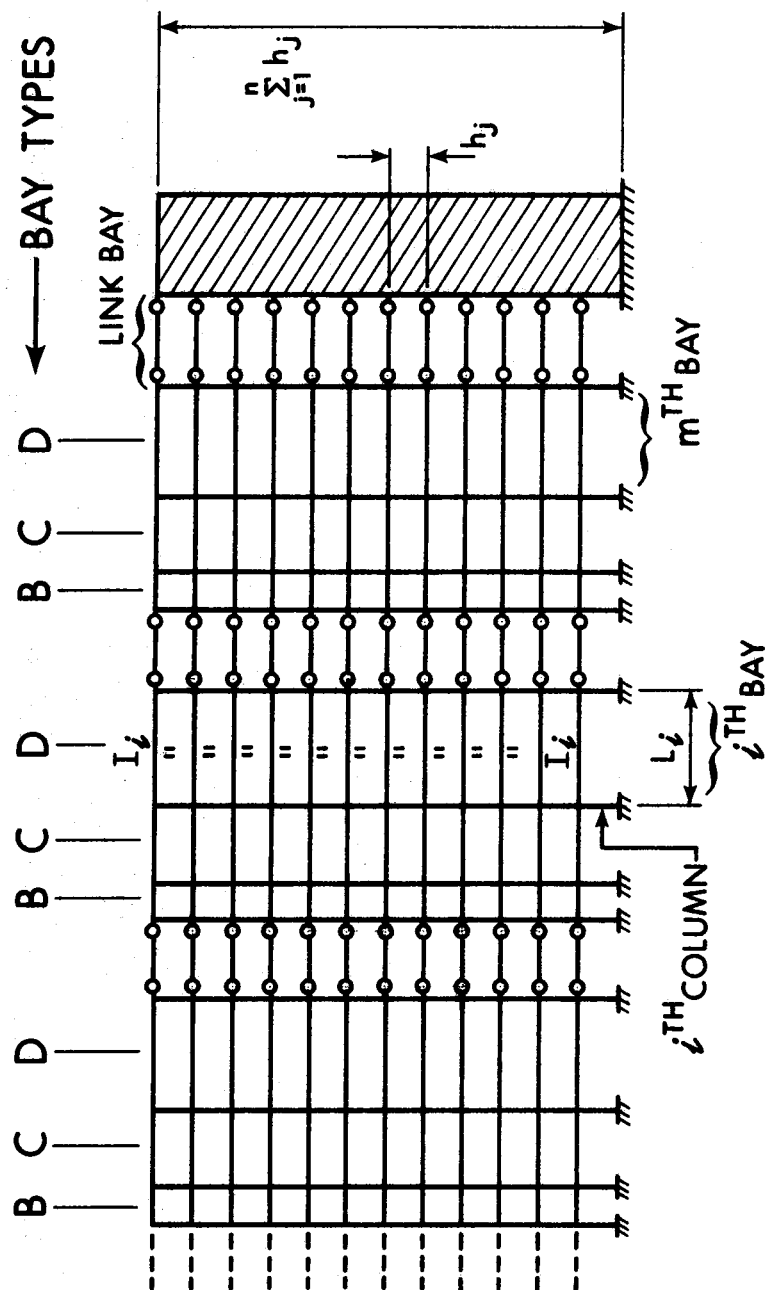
FRAME-SHEAR WALL STRUCTURE
